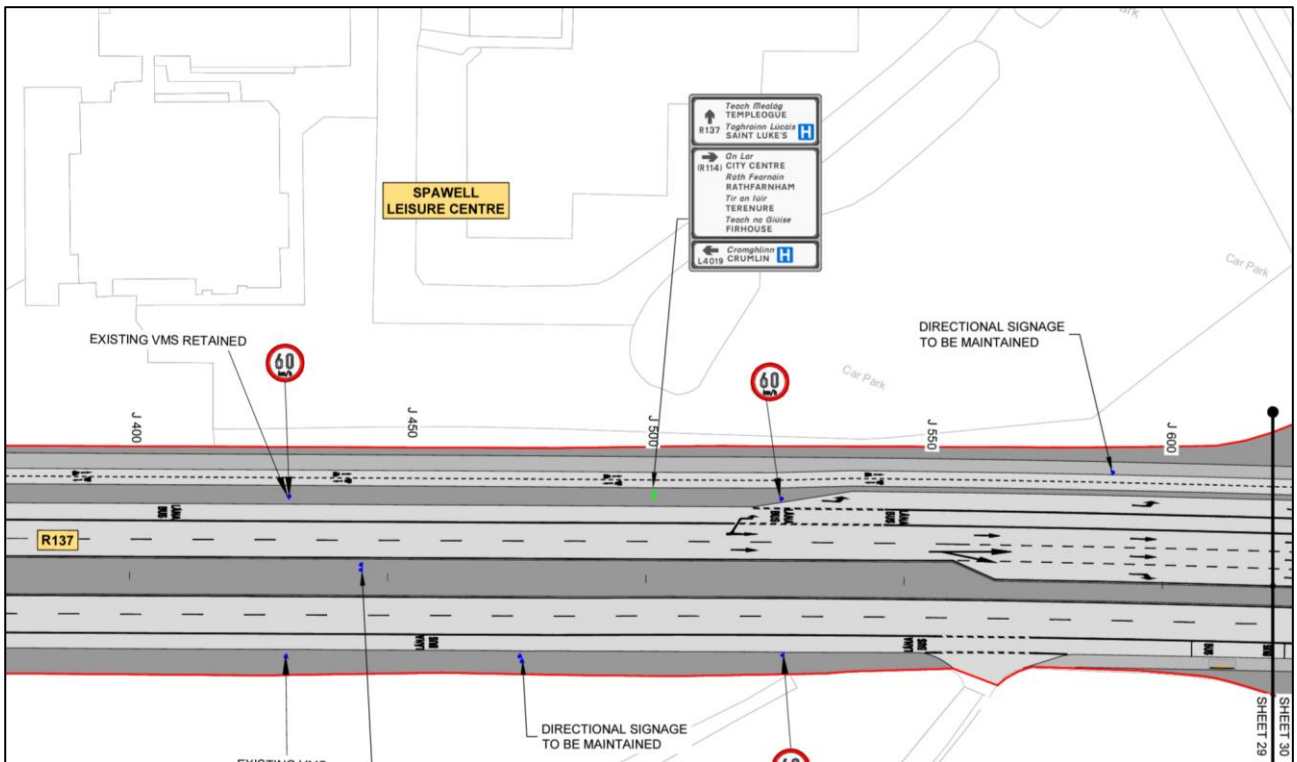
Extract from Traffic Signs and Road Markings Drawings (Sheet 29)
